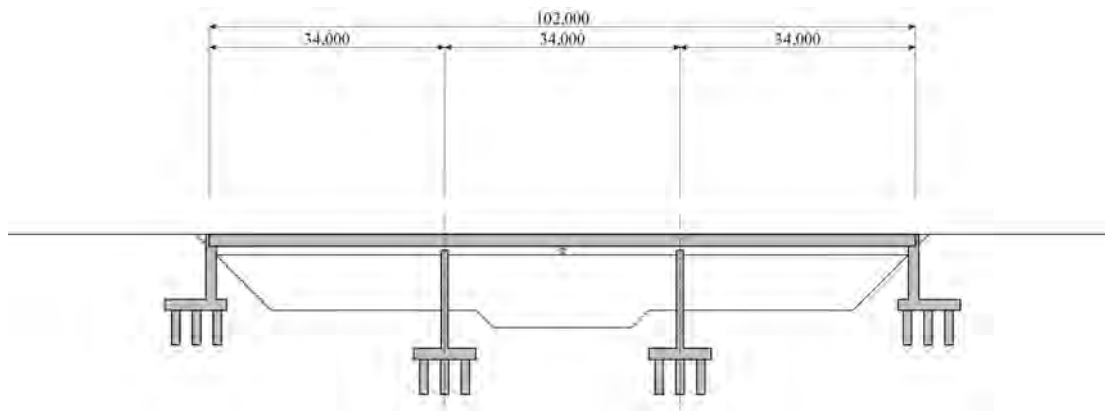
Draft of Kalaleh bridge and 14 metry bridge improvement
